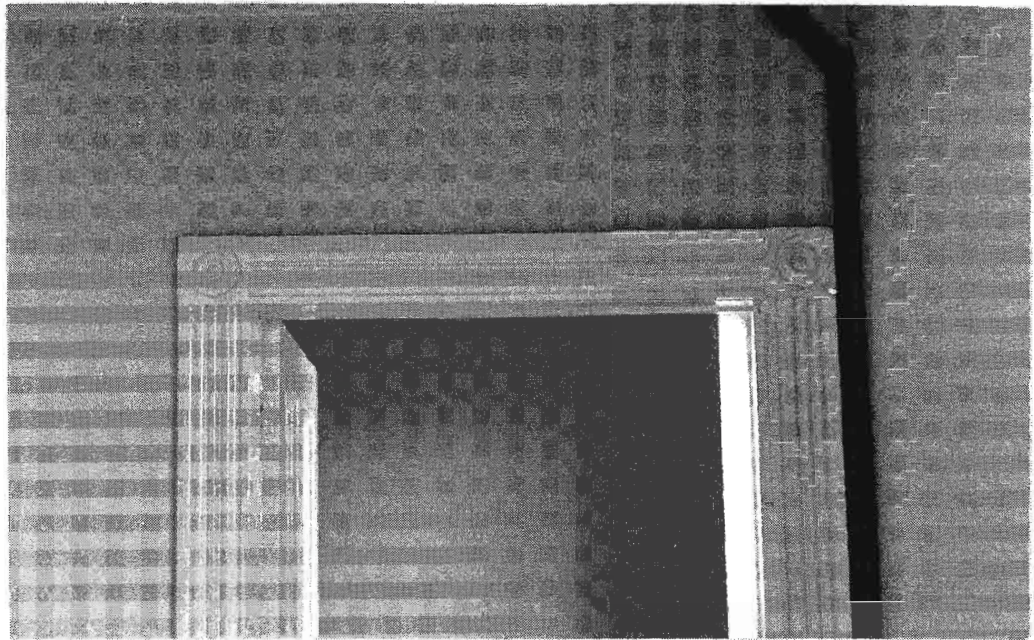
Detail of first floor window in 18<sup>th</sup> century build, see also *Plates 1, 2 and 4.
